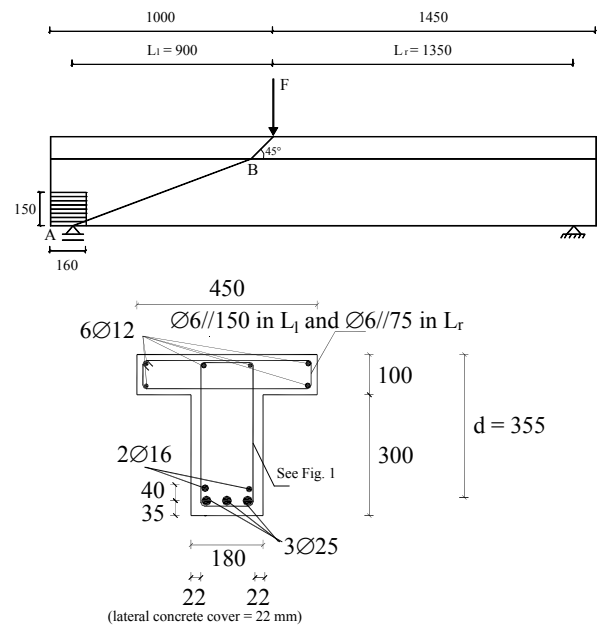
Beam prototype: geometry, steel reinforcements, loading and support conditions (dimensions in mm)
